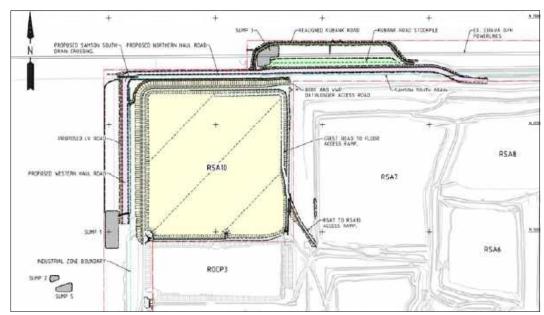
General Arrangement for RSA10 (Drawing No. WG005469)
